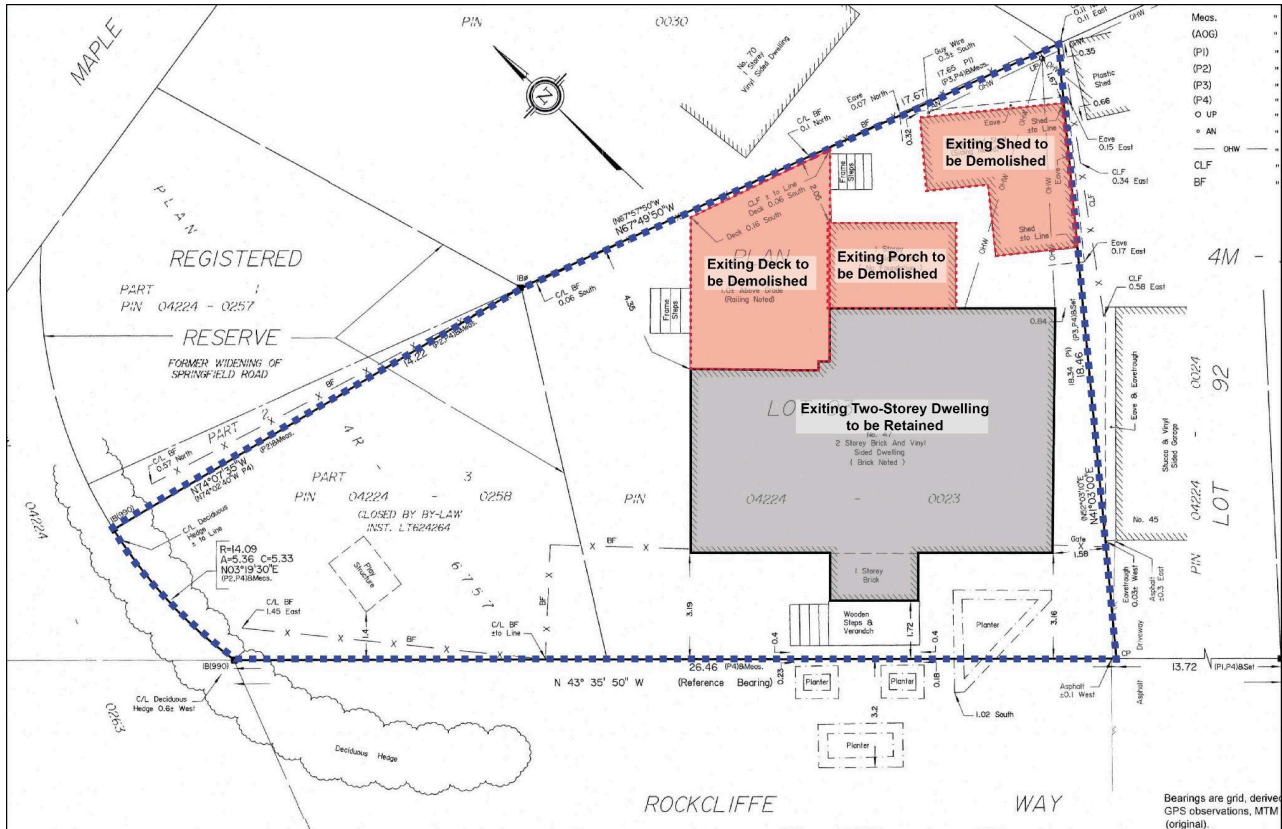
Survey Plan showing the *property boundary*, the *existing two storey dwelling to be retained* and *existing shed, porch and deck to be removed*, by Farley, Smith & Denis Surveying Ltd. dated June 16th, 2025.
